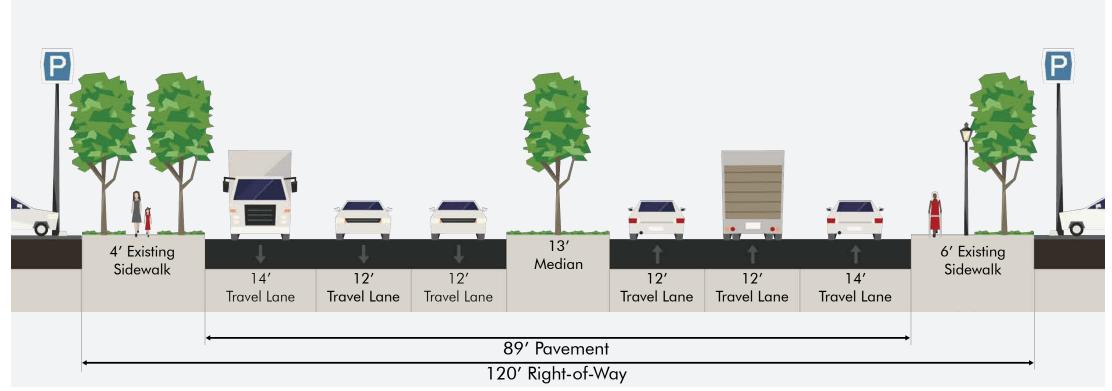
Proposed Alternative Cross-section - US 59 to Roark Road
